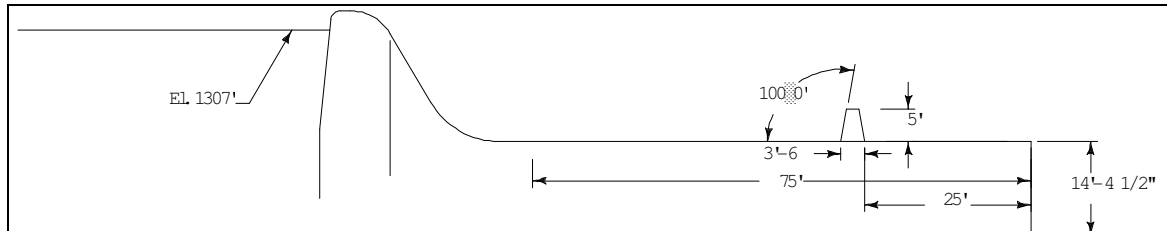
Sill Configuration No. 3. *This sill did not clean sediment from the upstream area of the sill, and caused a plunging flow into the secondary basin similar to configuration No. 1, and would require a longer secondary stilling basin.
